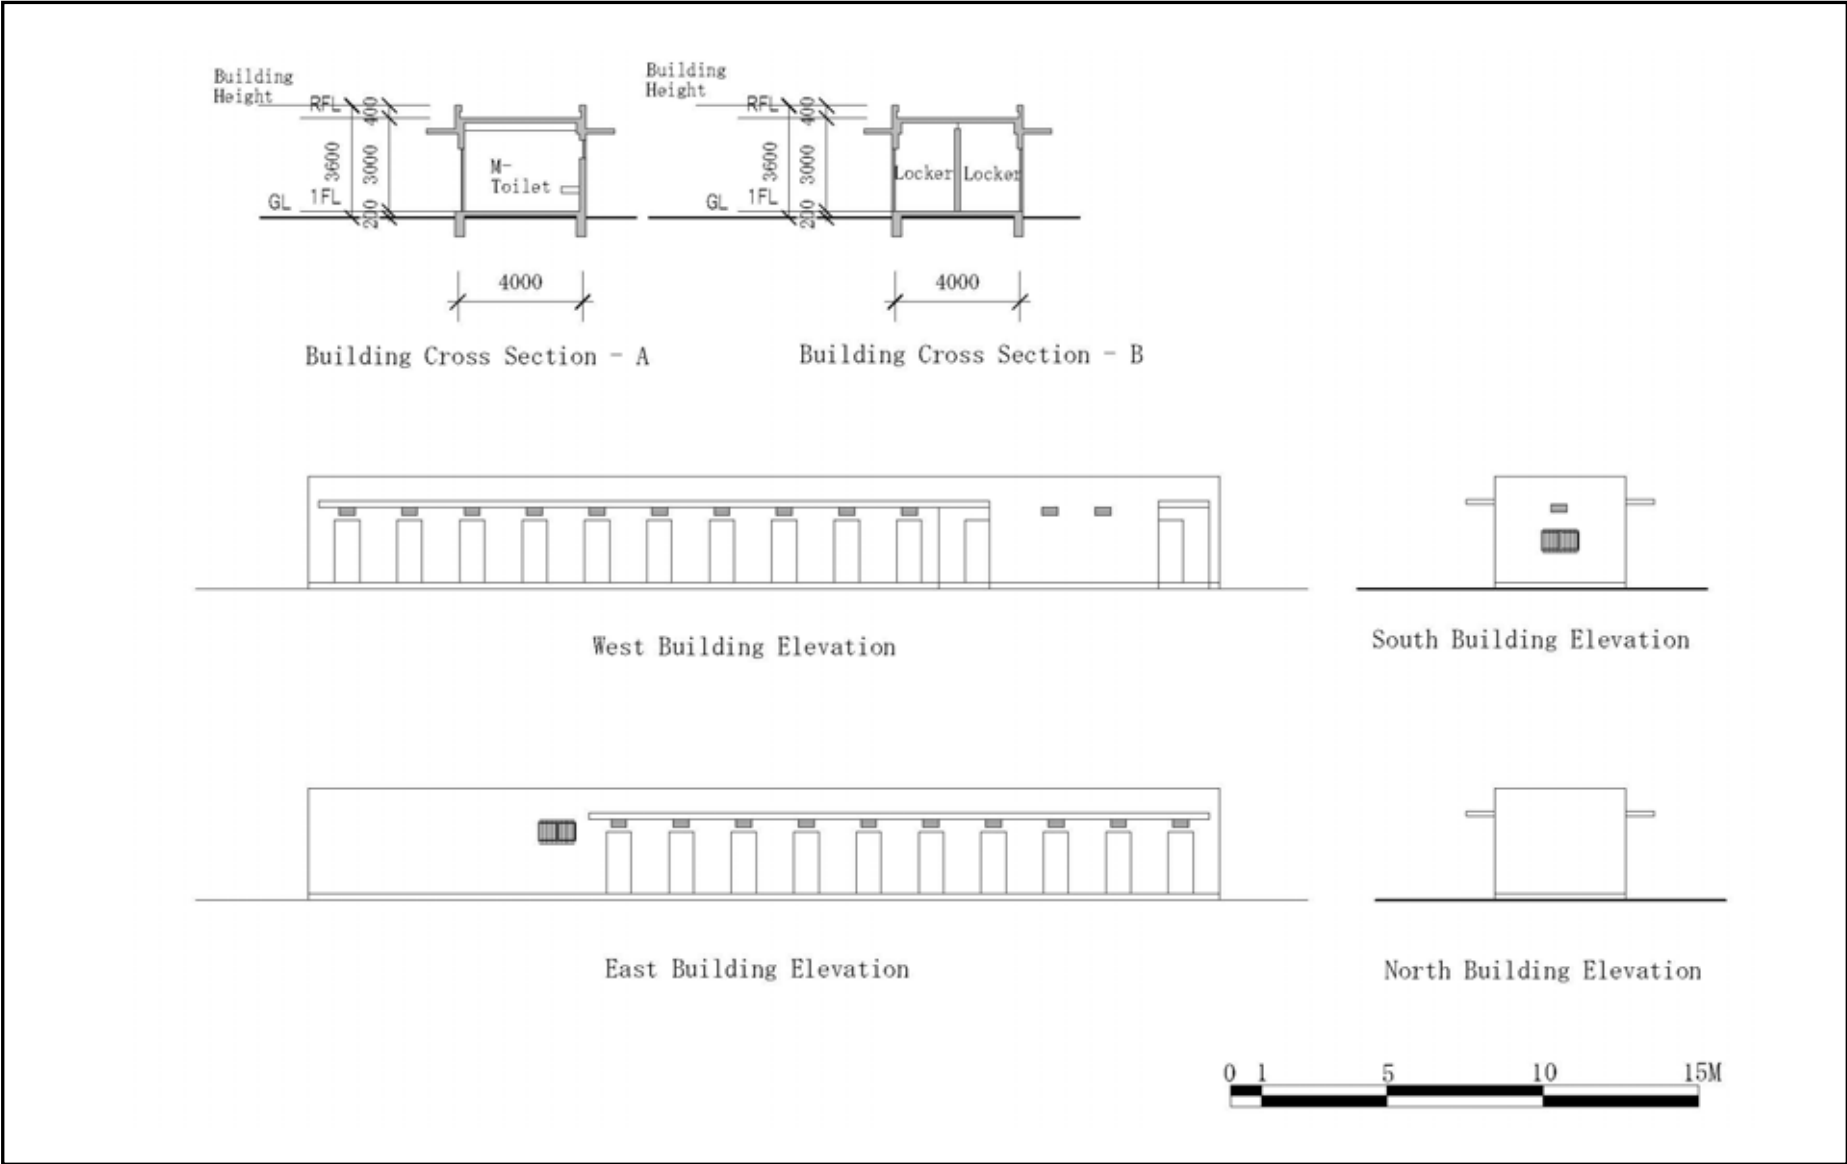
(16) Fishery Center Building Cross Section / Elevation
